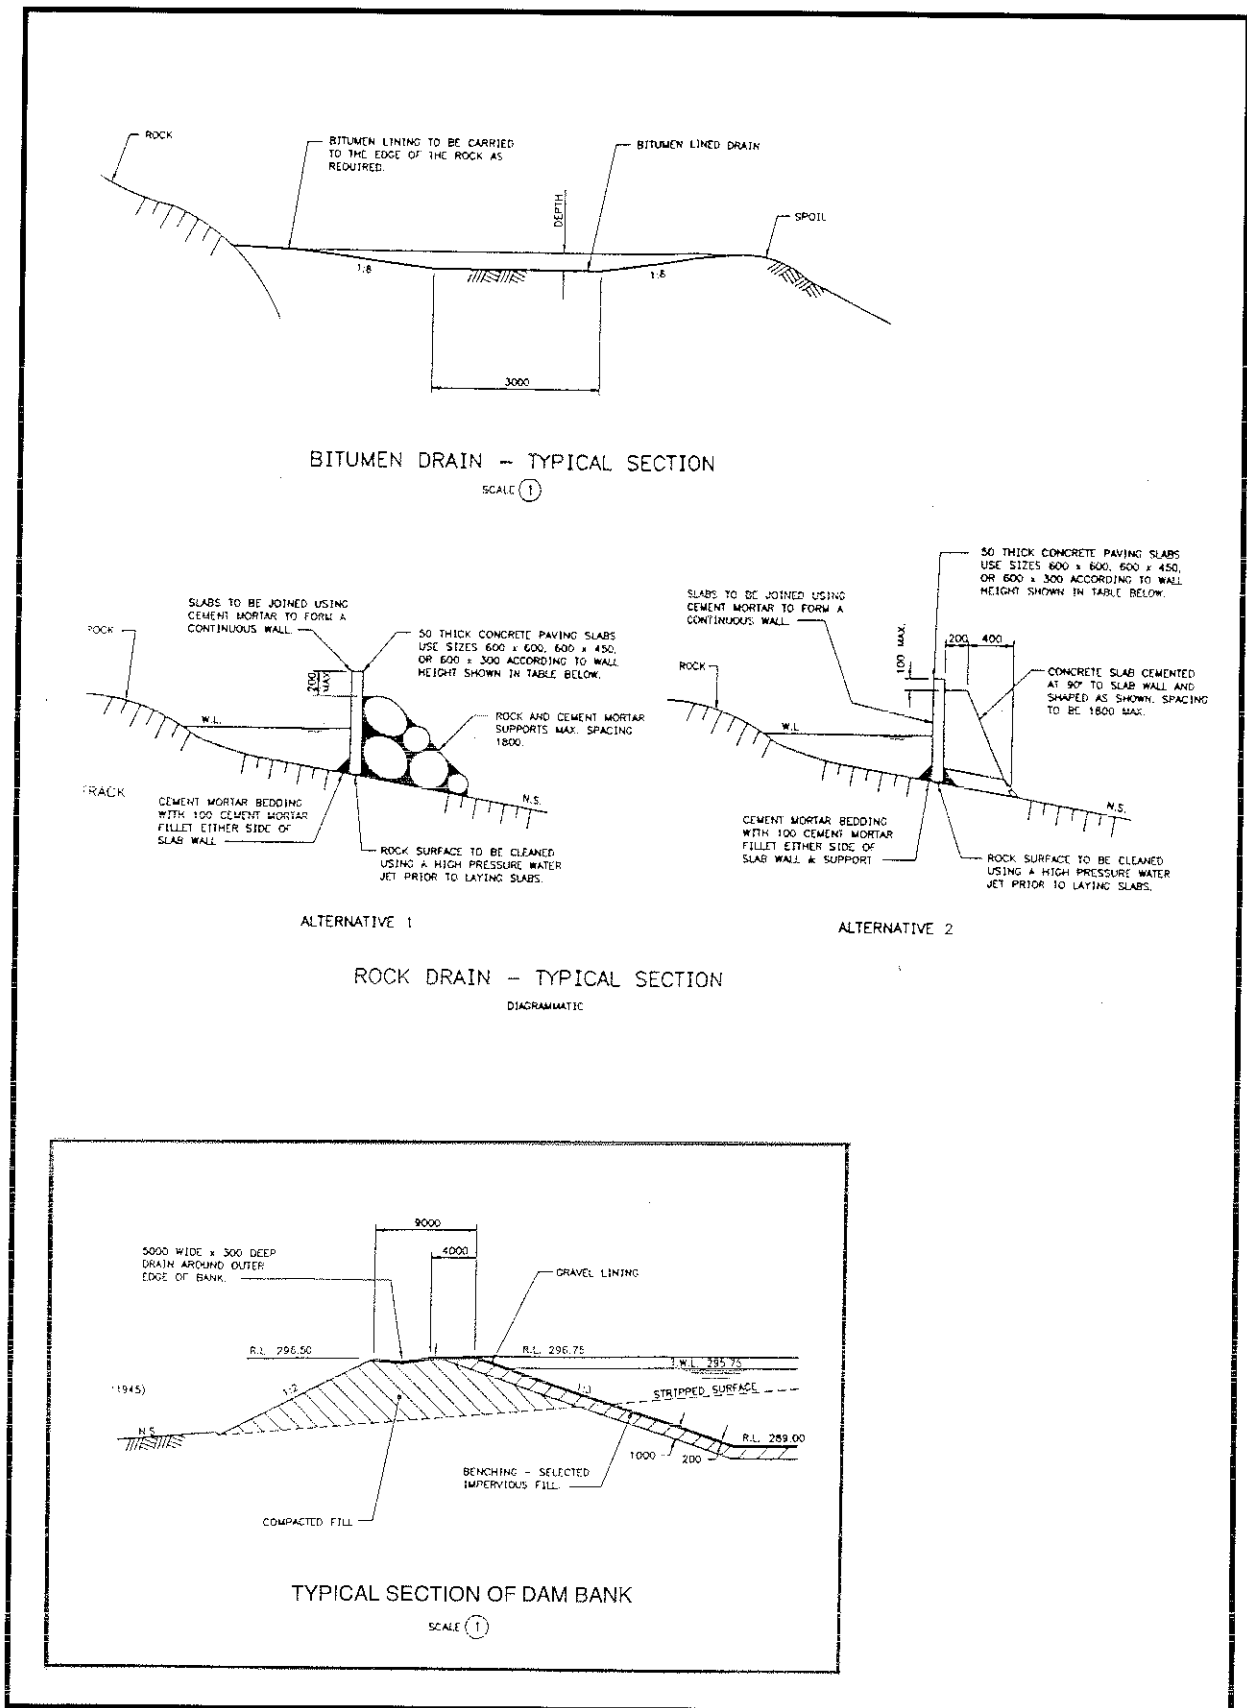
Typical profile and construction of the rock drain, bitumen channel and dam
